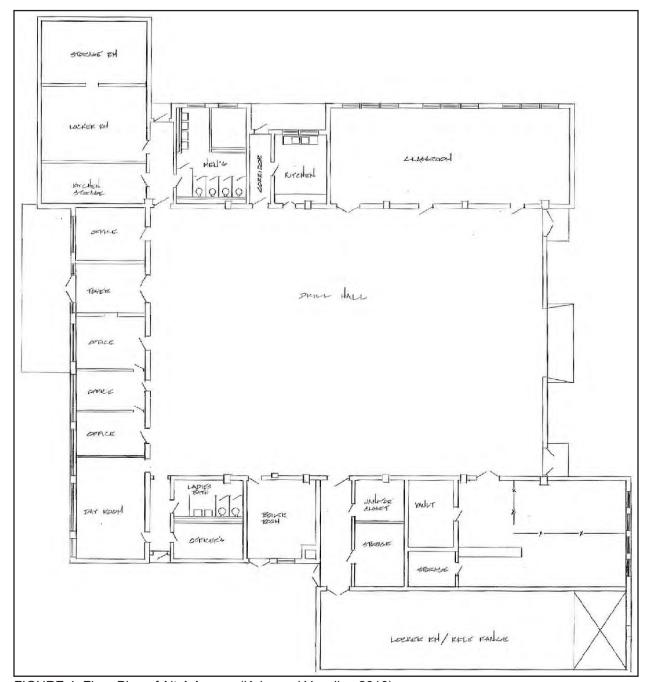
Floor Plan of Alt-A Armory (Kuhn and Yengling 2010)
